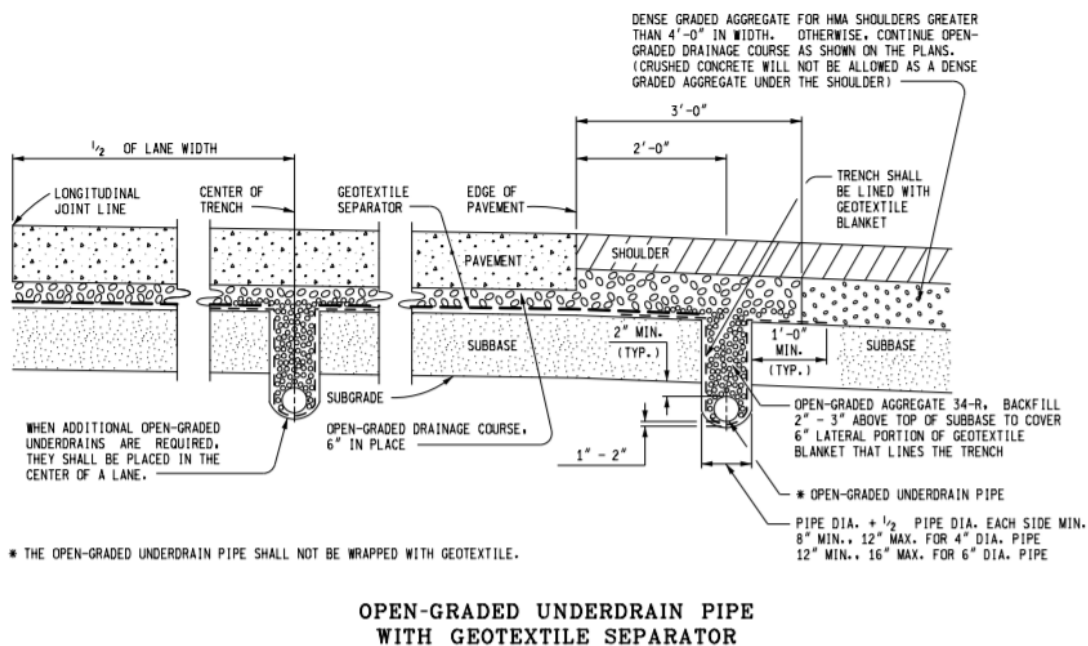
MDOT Open Graded Underdrain Detail, MDOT Standard Plan R80 Series (MDOT, 2012)
